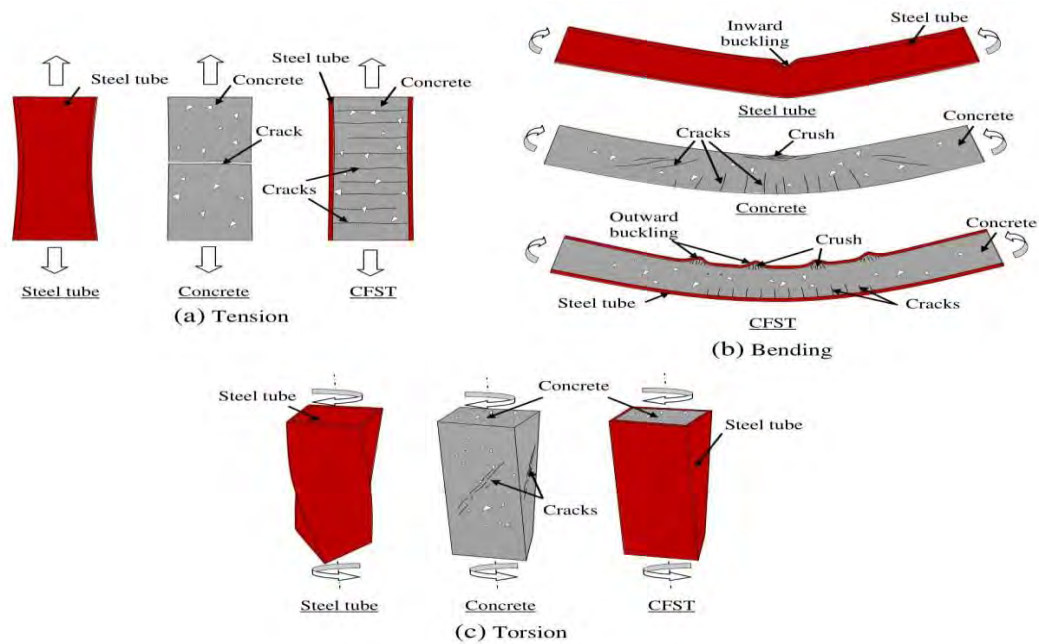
Schematic failure modes of steel tube, concrete and CFST under tension, bending and torsion.
